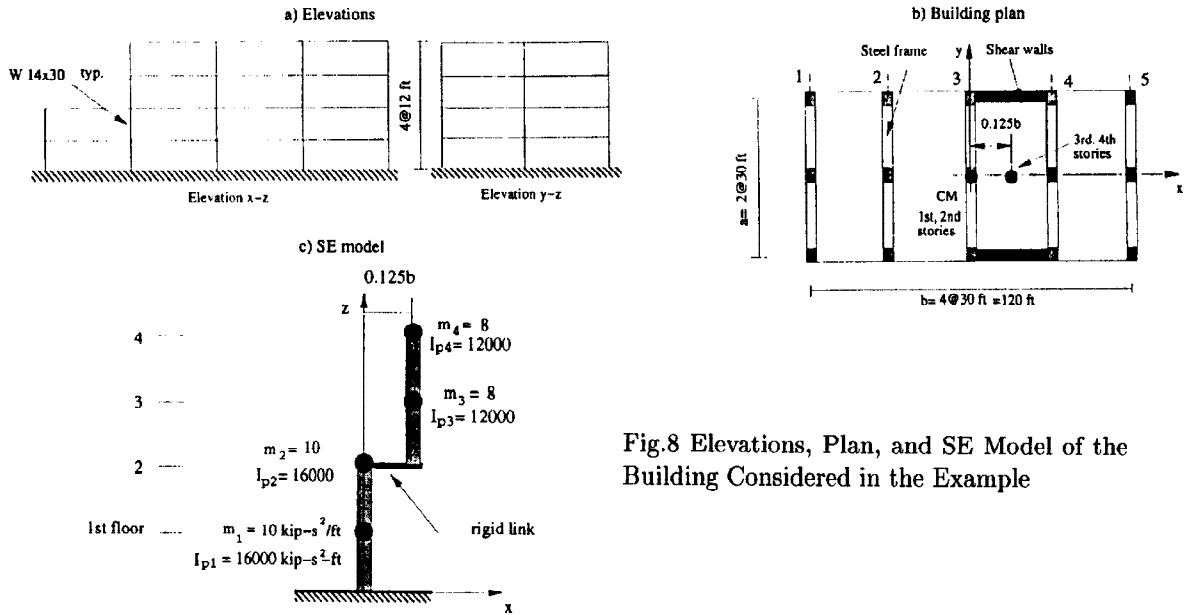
Elevations, Plan, and SE Model of the Building Considered in the Example
